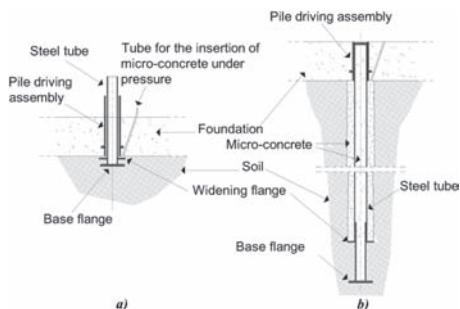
Pile sections: (a) detail of foundation with pile installation assemblies; (b) pile driving operations.
